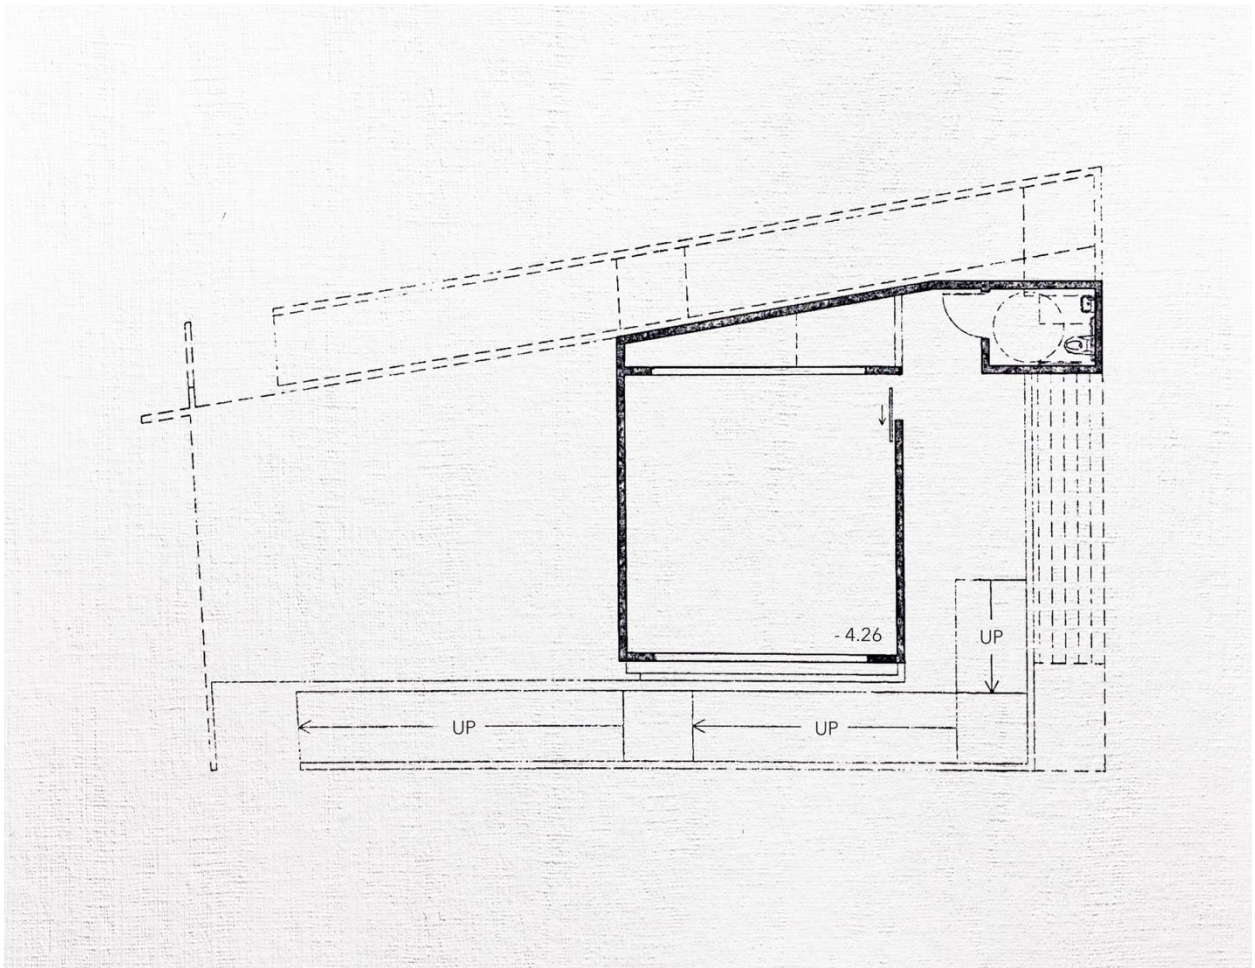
Image by Constanza Loustalet. Ground Floor Plan. 2020.
